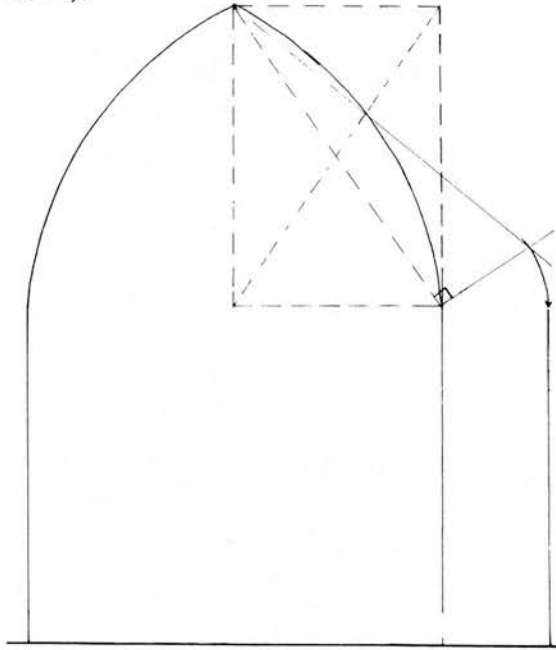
Rodrigo Gil's Method (as in Fig 12.13) adapted to a pointed vault
